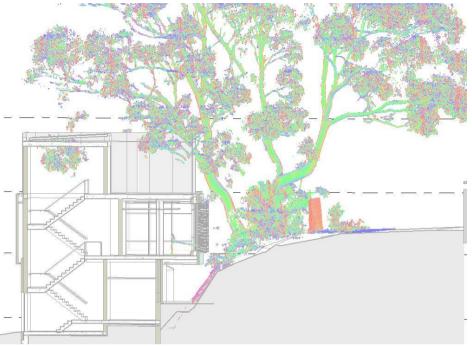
Shows tree 9 and point cloud assessment of branches conflicting with proposed Nutrition Centre
